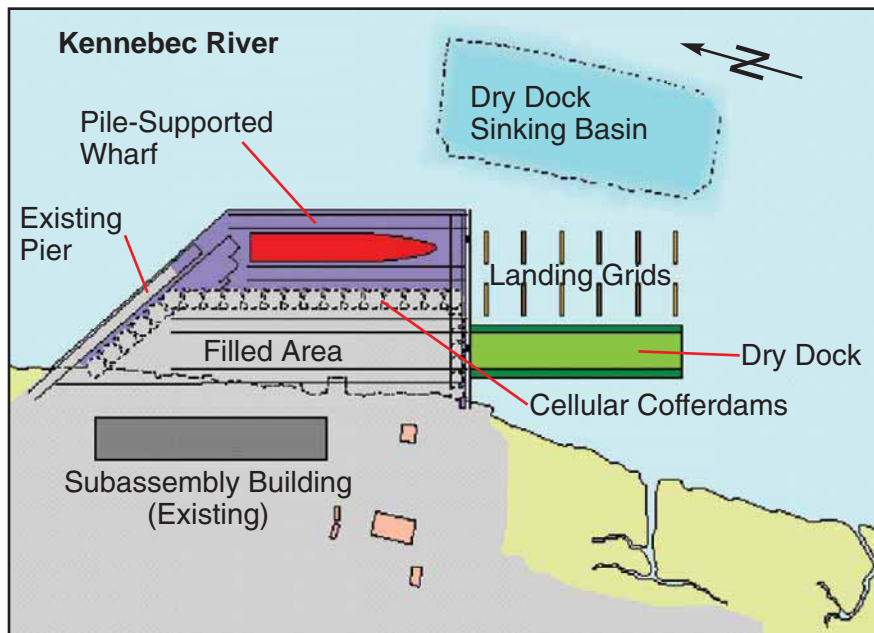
Schematic site plan of Bath Iron Works shows the existing shipyard and construction of new shipbuilding facilities, including the precast pile-supported open wharf structure.
